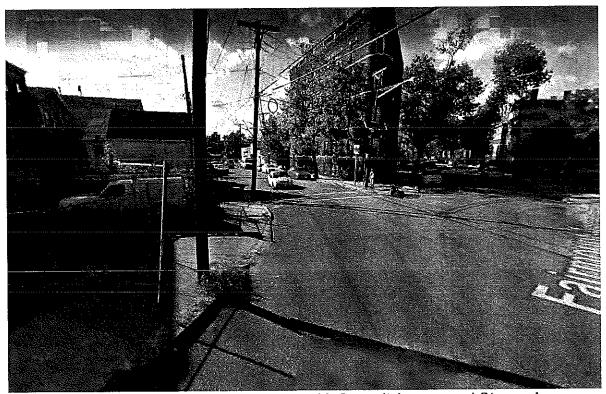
Intersection of Fairmount Avenue with Summit Avenue and Storms Avenue – faded and/or non-existent crosswalks, poor sidewalks and curbing, and lack of signage creates dangerous crossing conditions for pedestrians.
